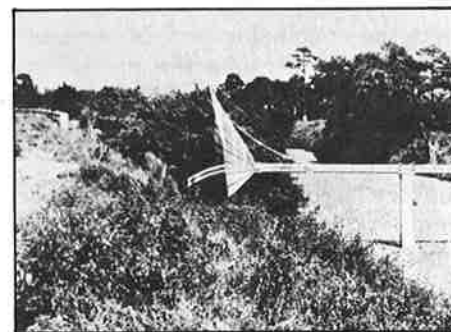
Side view of crossing guard showing how access to the crossing could only be gained by extreme agility or the use of ladders.
